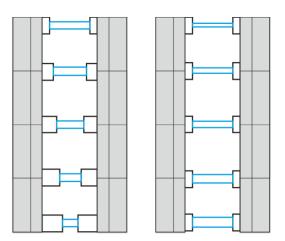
Adjustment of FUSEIS beam link system to storey shear by variable beam lengths (left) or variable cross sections (right)
